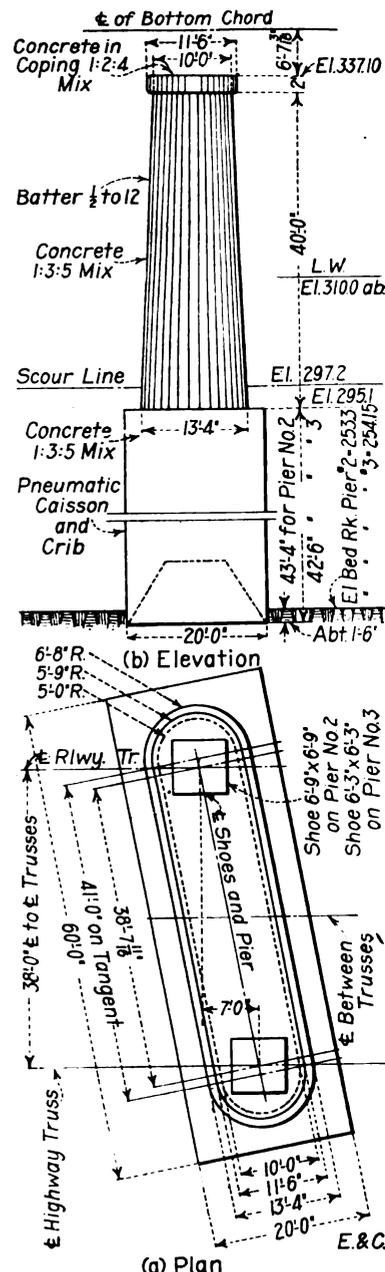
Plan and End Elevation of Piers Nos. 2 and 3 (River Piers) of East Kansas Ave. Bridge.
